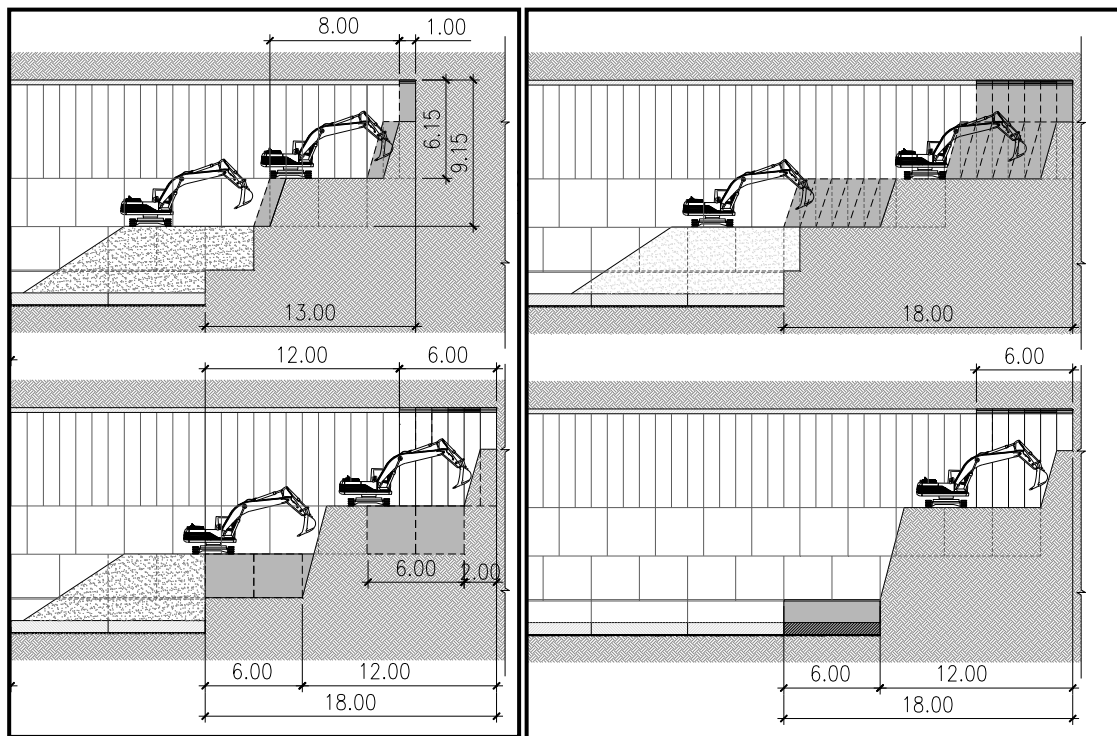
Longitudinal sketches of construction stages, Las Heras, Santa Fé and Córdoba stations.
